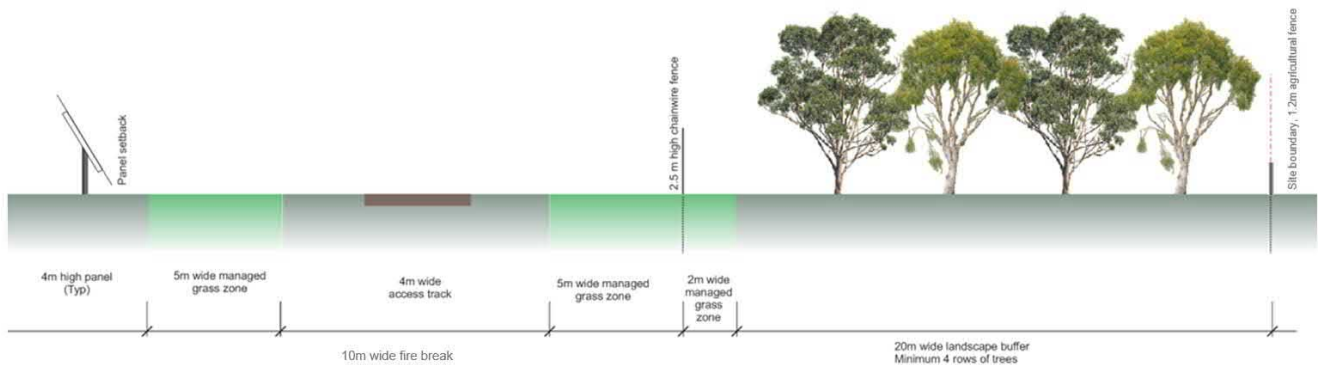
Previous Application: Proposed Landscaping Section Detail (Source: Amended Plans Diagram 5 prepared by Ecological Australia 09 May 2019)
